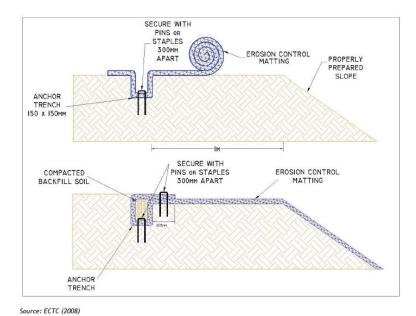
Anchoring detail for erosion control matting source Swan River Trust 2009 source ECTC 2008⁷
